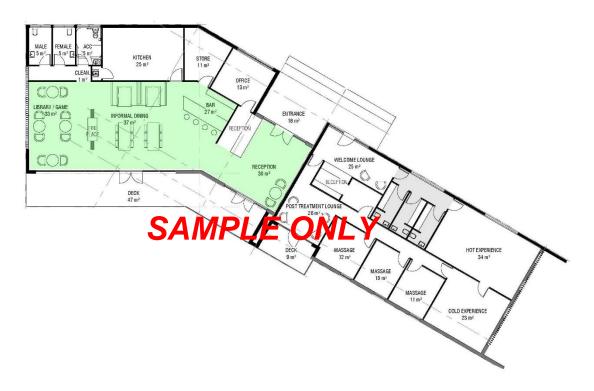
LOCATION OF LAST RESORT REFUGE
